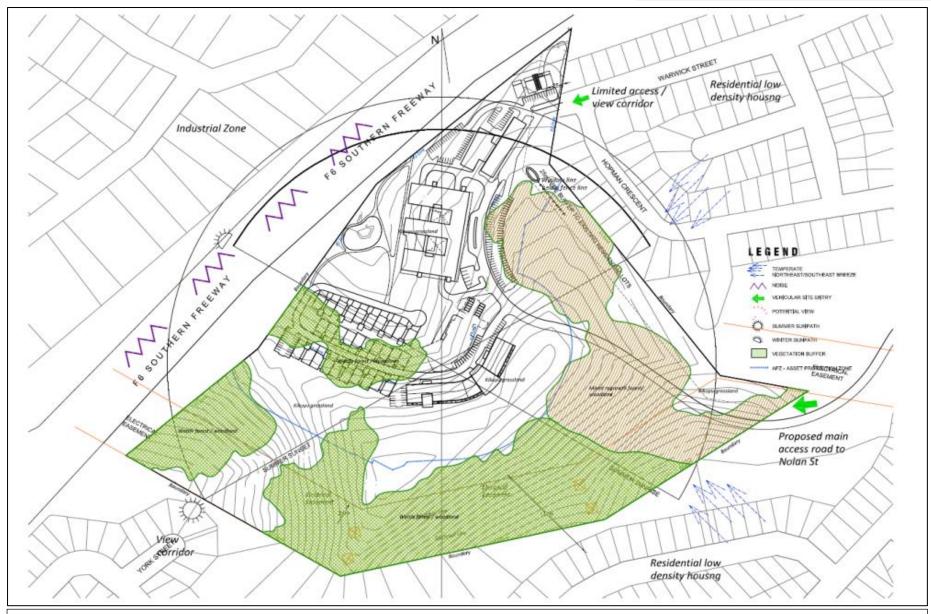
Plan Showing Vegetation on the Site with Building Overlay
